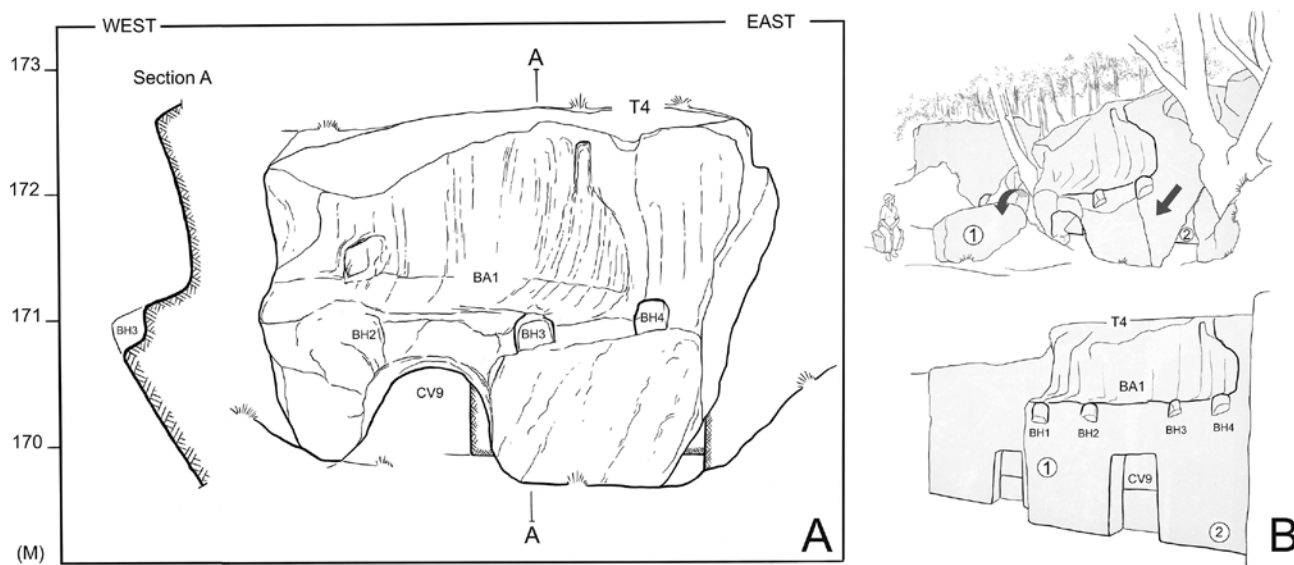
A–B. A. Technical profile drawing with section (A) of the northern bridge abutment, showing platform T4's detached front façade with the rock-cut bearing for vertical support (BA1), and three out of four cavities for inclined struts (BH2–BH4). B. Reconstruction of the partly detached platform T4 with BA1 (below), alongside a depiction of the current state of the façade (above). The upper part of T4 is currently obscuring the façade of chamber tomb CV9 (2), now positioned behind T4 and BA1. A secondary fragment of the same façade has come loose and is concealing BH1 (1). Drawing by R. Holmgren. Copyright: Richard Holmgren ARCDoc.
